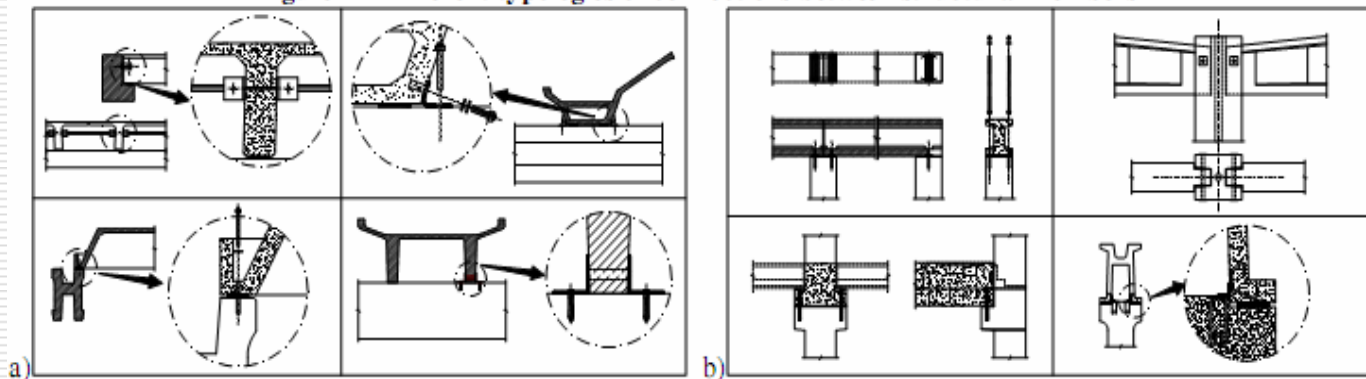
a) Roof element-to-beam connections; b) Beam-to-column connections
